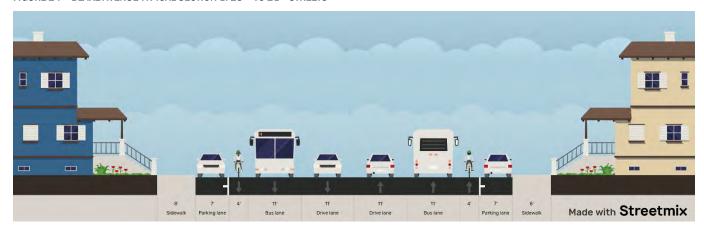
BLAKE AVENUE TYPICAL SECTION 2: 21ST TO 19TH STREETS
